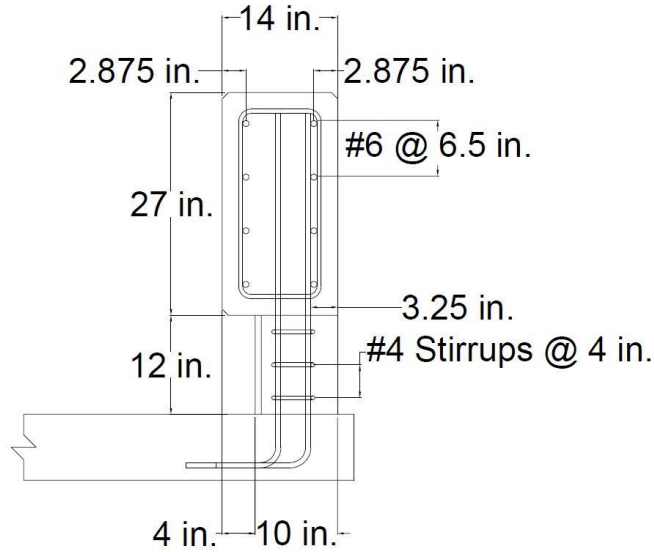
New Open Concrete Bridge Rail Interior Section, Cross Section
